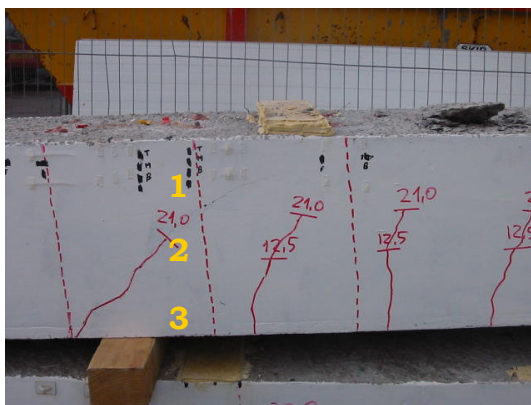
Left span of SLB P4d-2S8@d at failure
